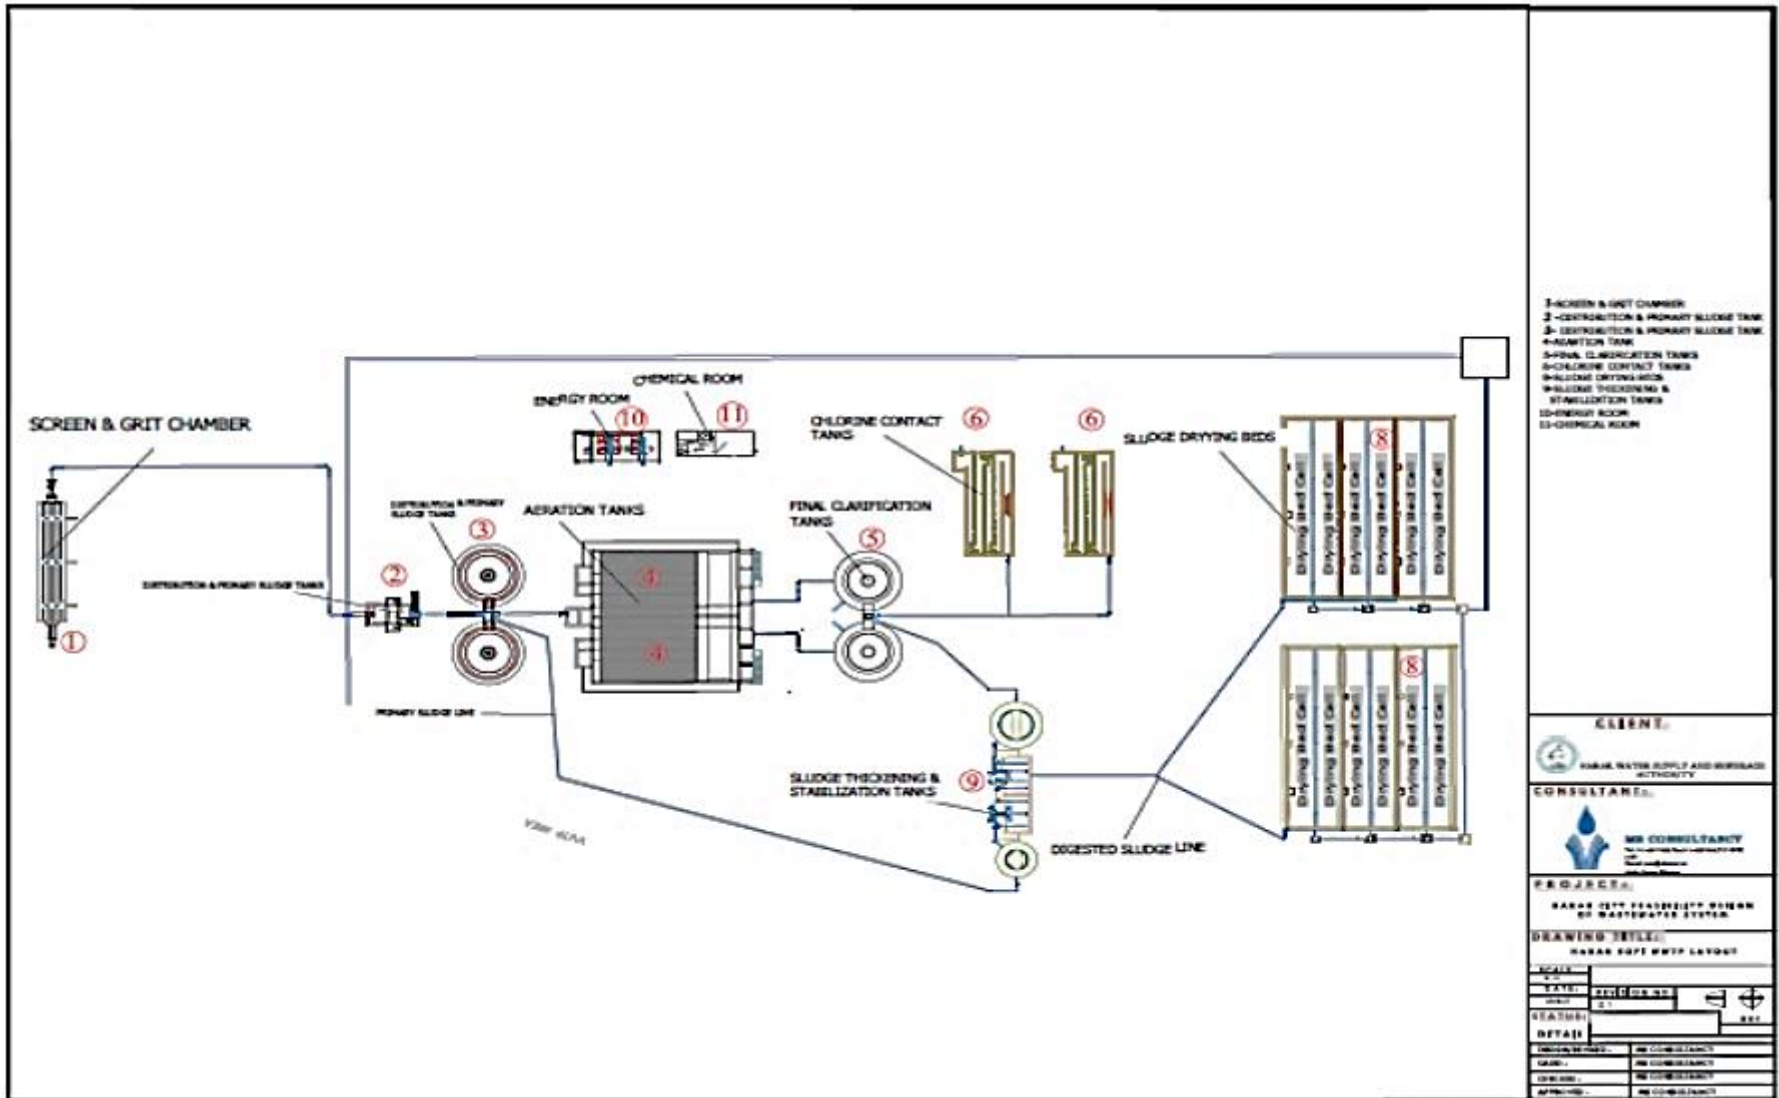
Layout of Proposed Waste Water Treatment Plant at the Sofi site
